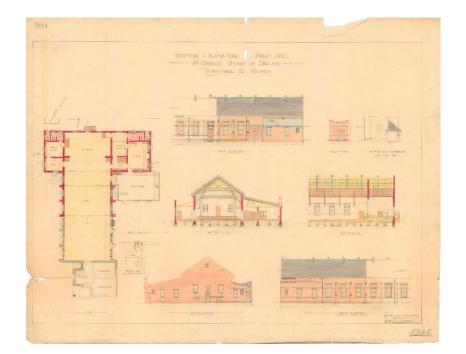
Plan of Additions and Alterations to Parish Hall A & H Peck, 1925 (Source: SHC MB3310)
